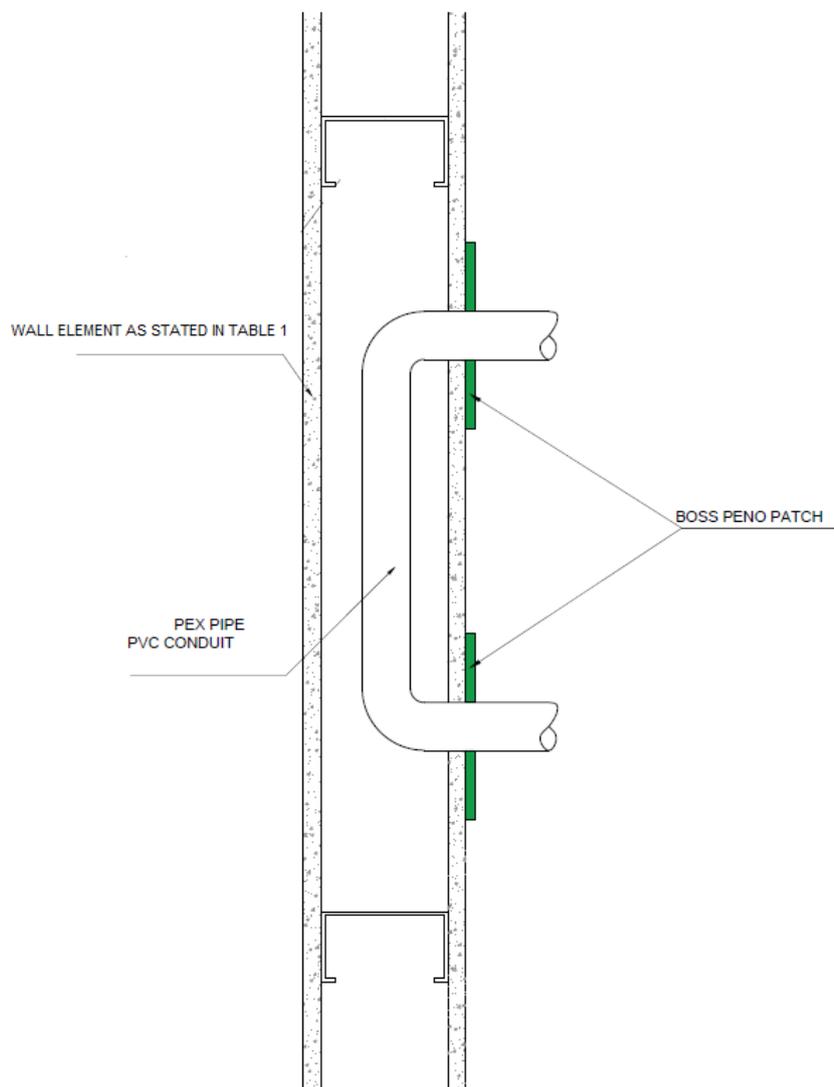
Pe-Xa pipe or PVC conduit penetrating the wall without exiting to the other side
